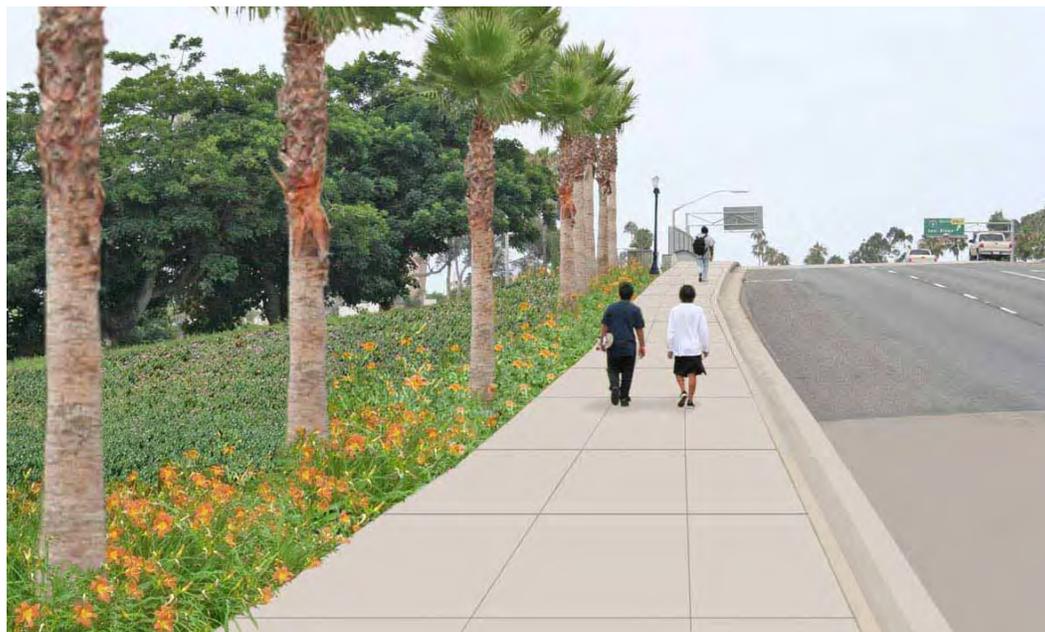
Key View 17 - I-5 at Mission Avenue: Proposed view looking west
